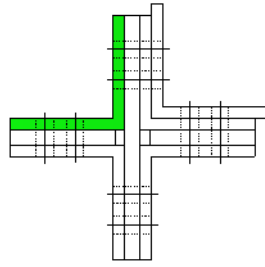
Bending on lower main member 1 (Specimen-2)
